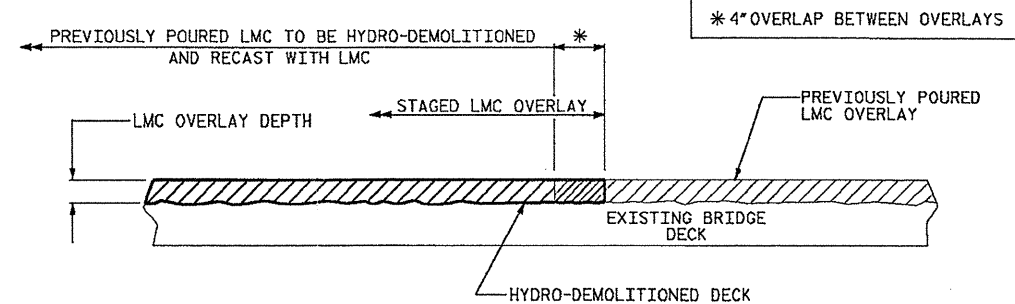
DETAIL FOR LATEX MODIFIED CONCRETE OVERLAY
